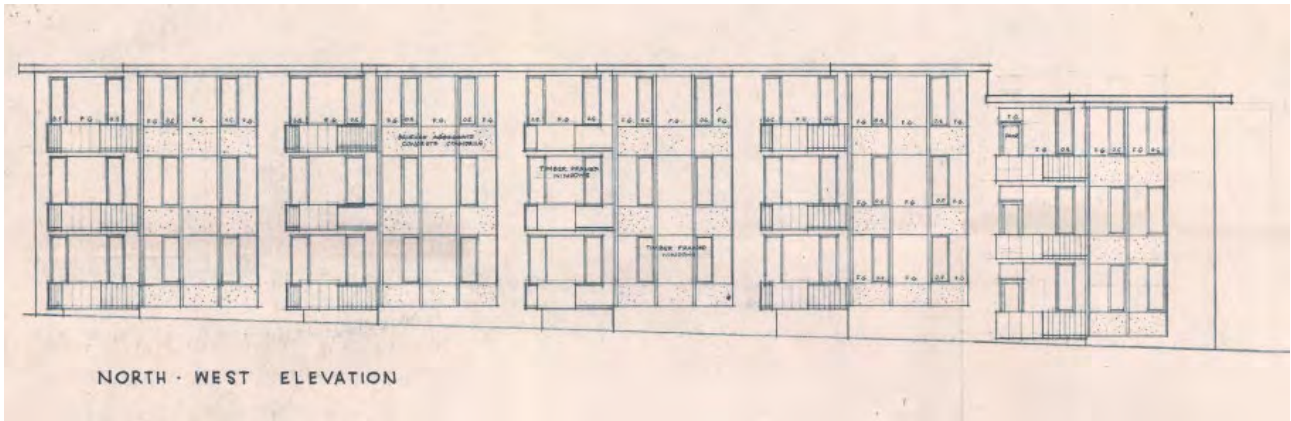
1968 drawing showing the north-west or garden side elevation (Source: BP)
